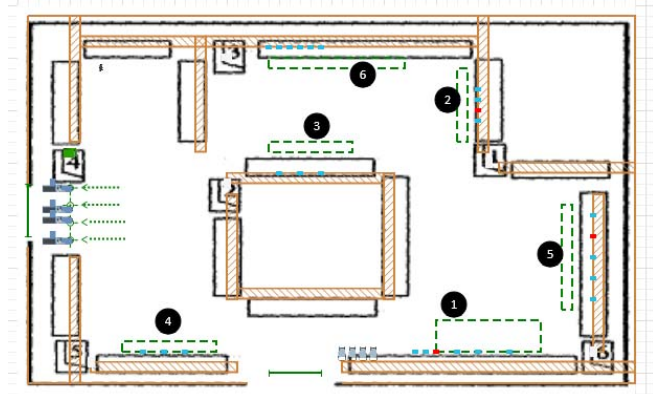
2-D model of the trading room plan with the virtually marked zones.
